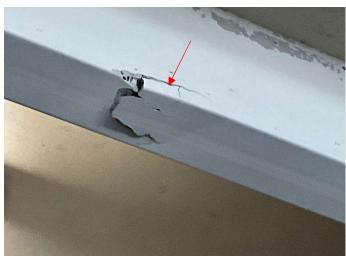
Concrete spalling at ceiling of parking garage.
